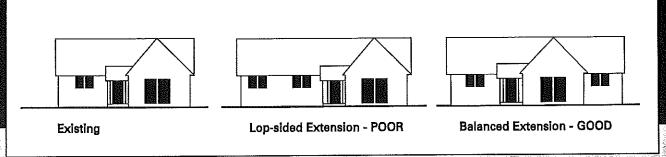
MAIN FRONTAGE GABLE - creating a balanced elevation
